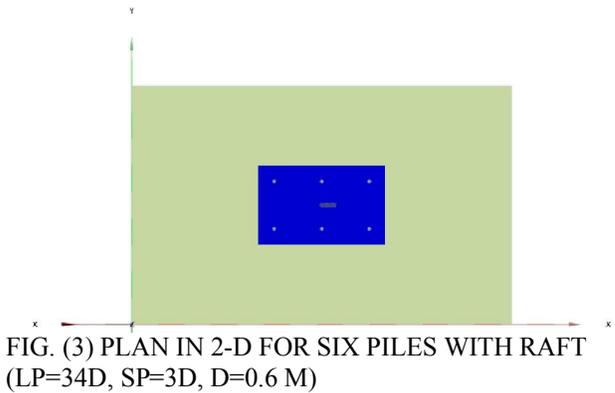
PLAN IN 2-D FOR SIX PILES WITH RAFT (LP=34D, SP=3D, D=0.6 M)
